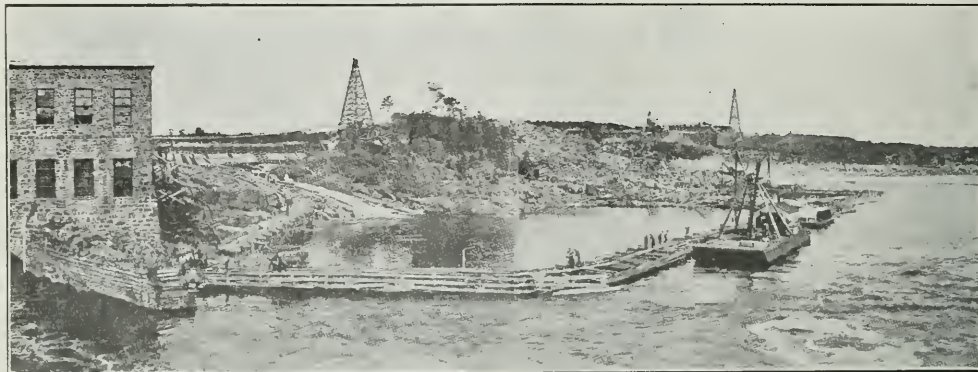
General View, Showing Present Power House and Dam, One of the Cable Towers, Cofferdam Under Construction, Main Island, Crushing and Mixing Plant, and the Main Channel of the St. Maurice.
